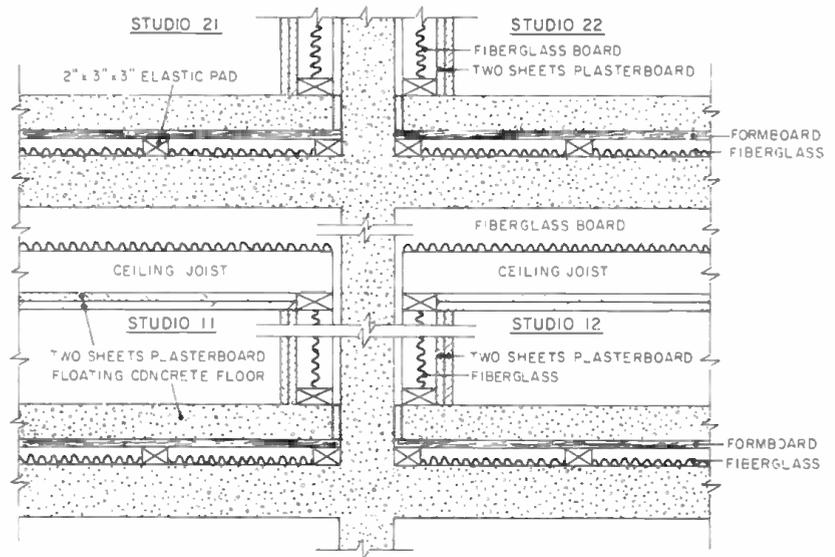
Cross-section of a studio complex, showing a floating concrete floor.
